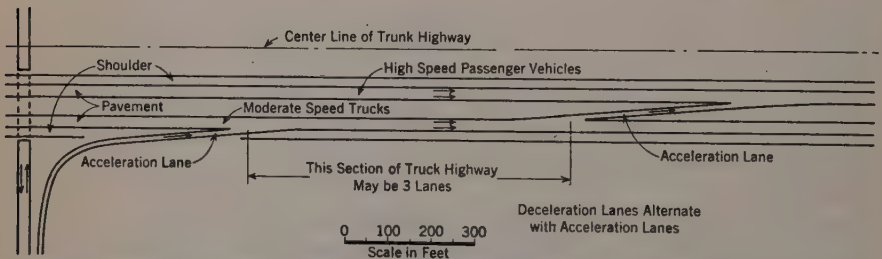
ACCESS PLAN FOR A FOUR-PAVEMENT TRUNK HIGHWAY. ONE QUADRANT IS SHOWN; OTHER QUADRANTS ARE SIMILAR.
